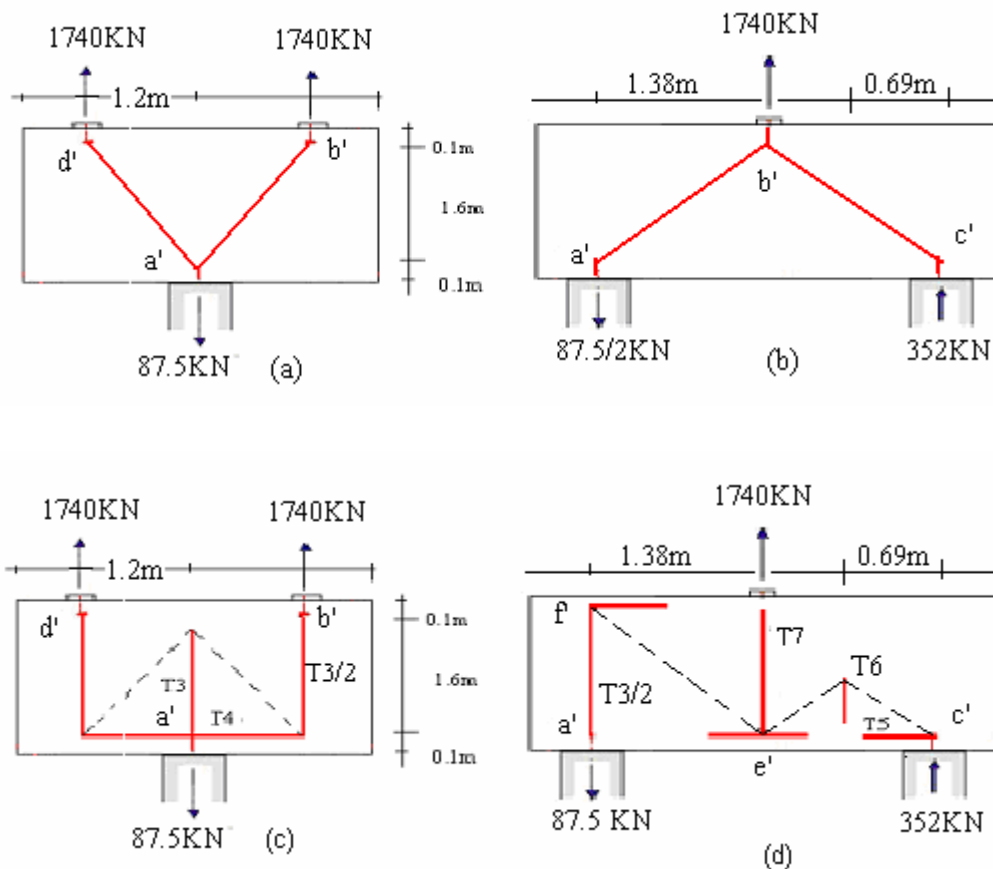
the boundary forces on the tension side of region near column A, a) & b) simple truss c) & d) the refined STM with practical reinforcement layout
